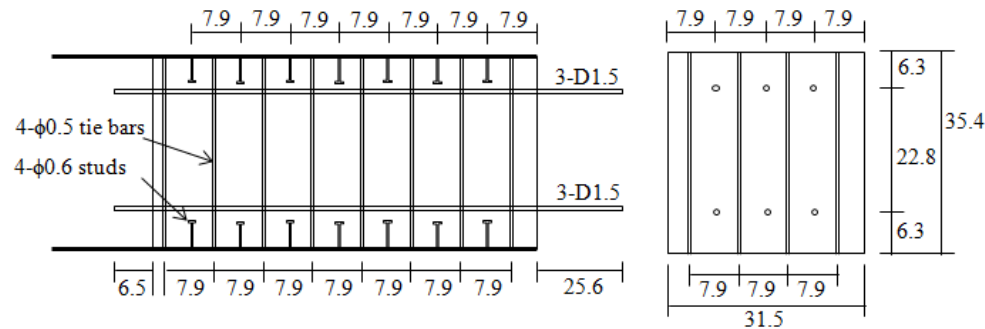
Typical configuration of test specimens (dimensions in in.)
